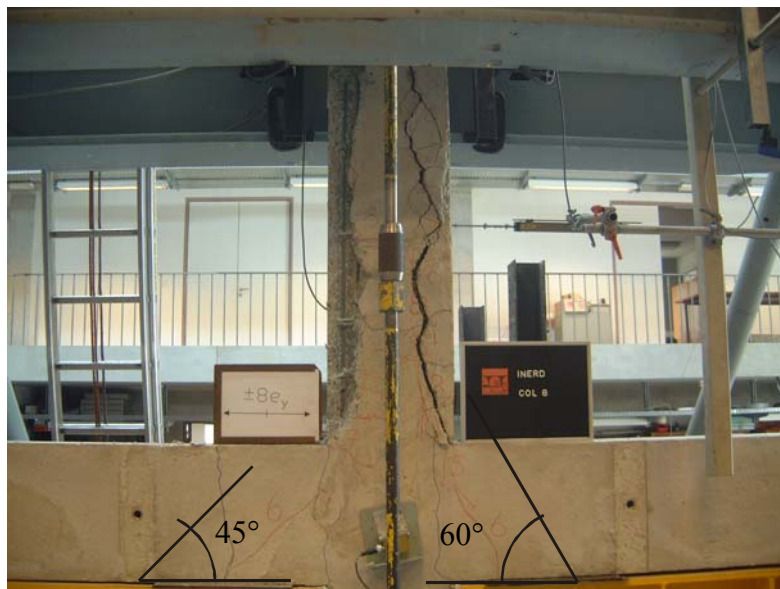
Visual inspection of the cracks in specimen COL8
